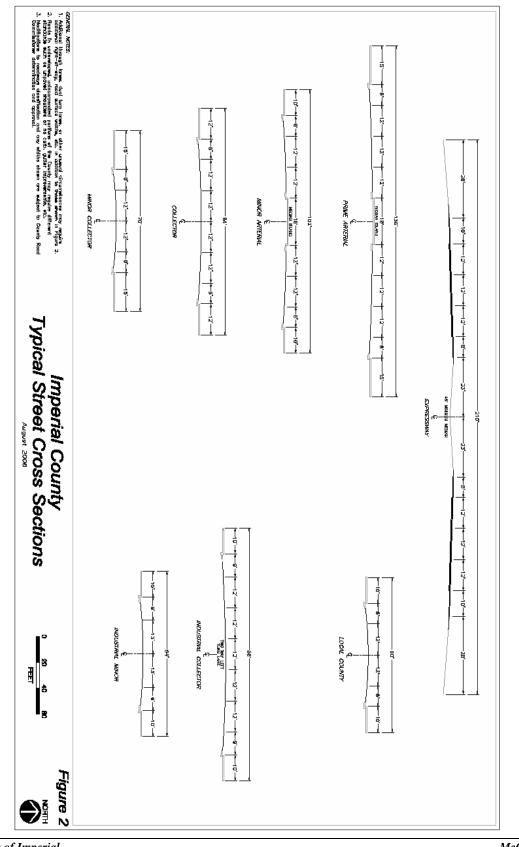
GENERAL PLAN CIRCULATION ELEMENT STREET CROSS SECTIONS
